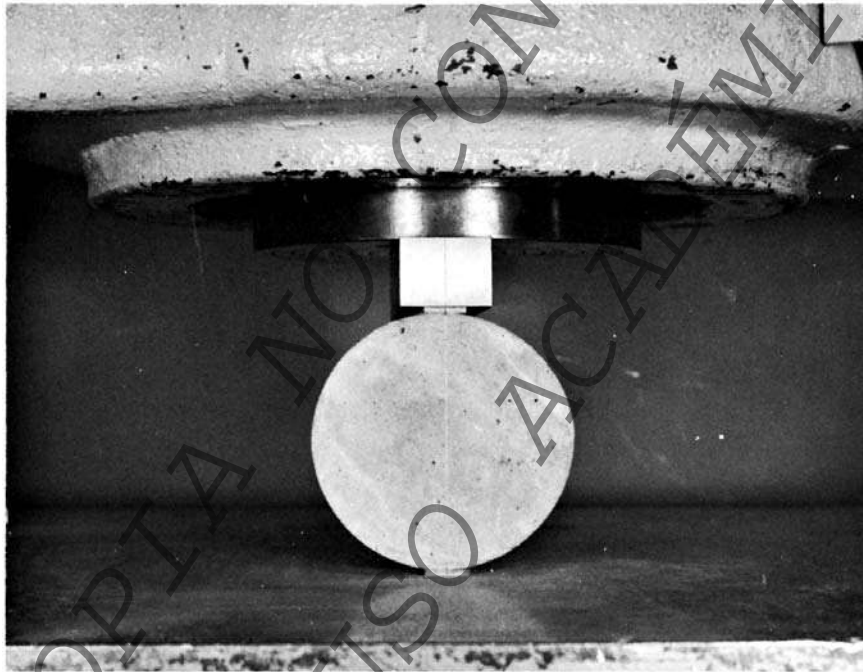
Specimen Positioned in a Testing Machine for Determination of Splitting Tensile Strength
